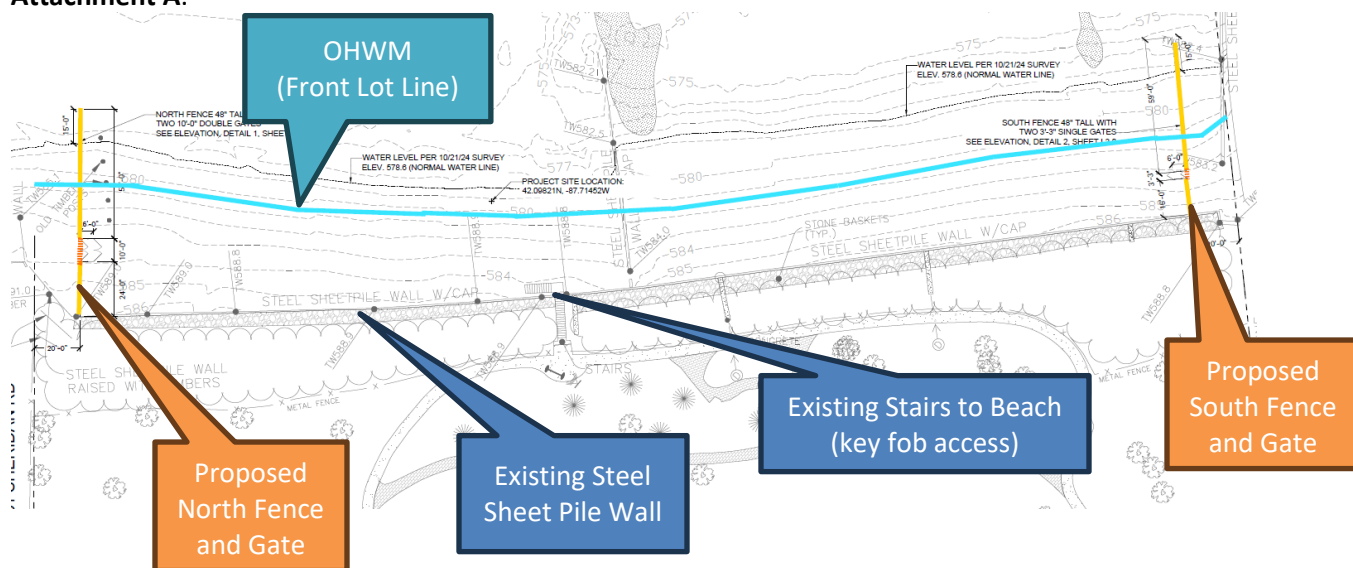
Original Plan - Site Fencing Plan (Sheet L2.0)
